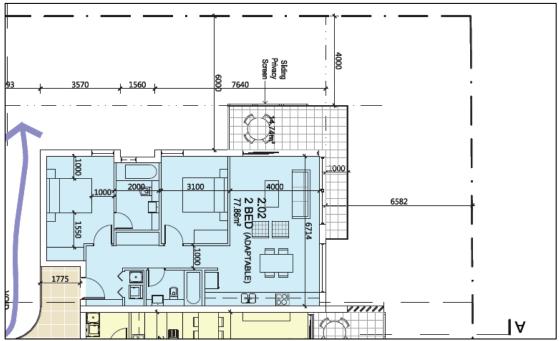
Layout of the balcony of Unit 2.02 as approved under the original consent.
